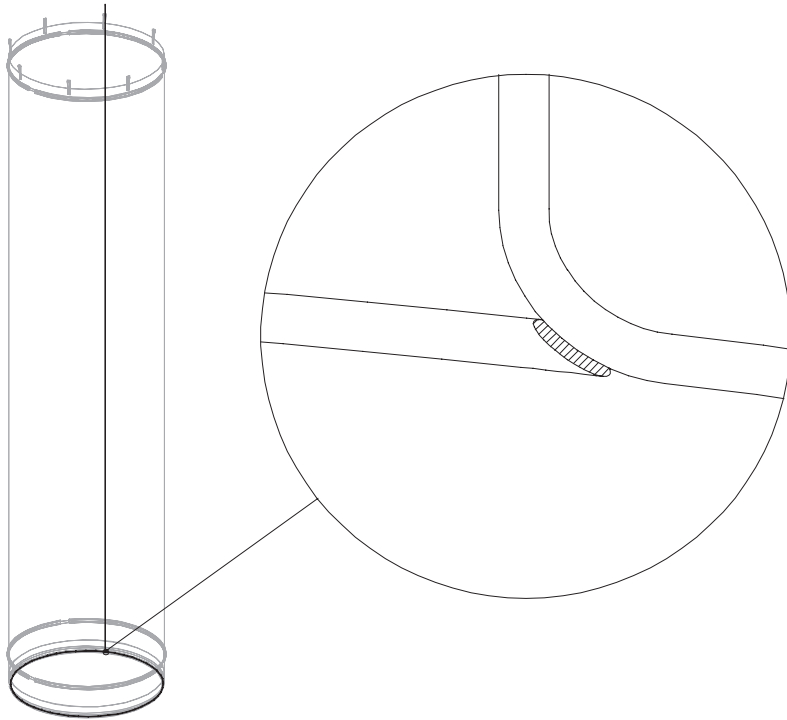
Sketch of the mounted O-ring. The o-ring makes a complete loop in the seal before extending up to the deposition hole top at “floor” level.
